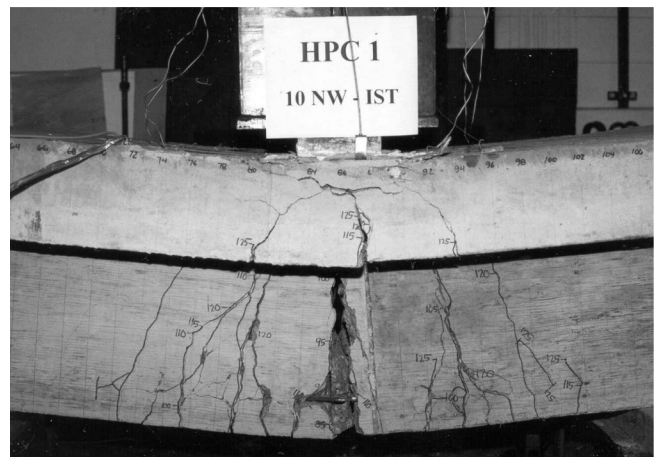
Multiple-strand development length specimen HPC-1 after failure (south face).
